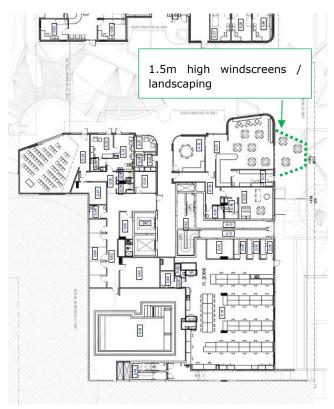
Ground floor plan with the recommended wind control measures overlaid.
